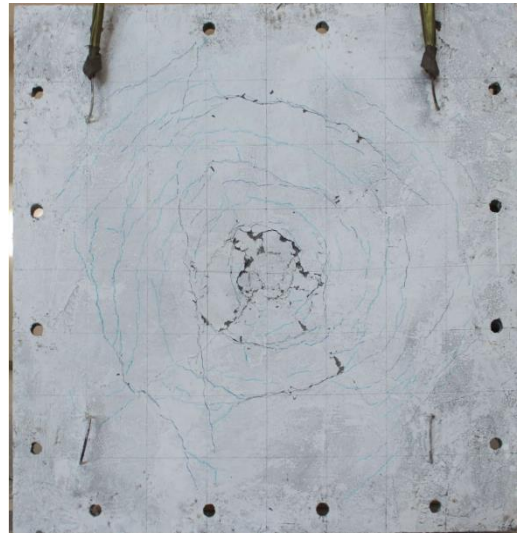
Bottom surface crack patterns after testing for panel JN3-075
